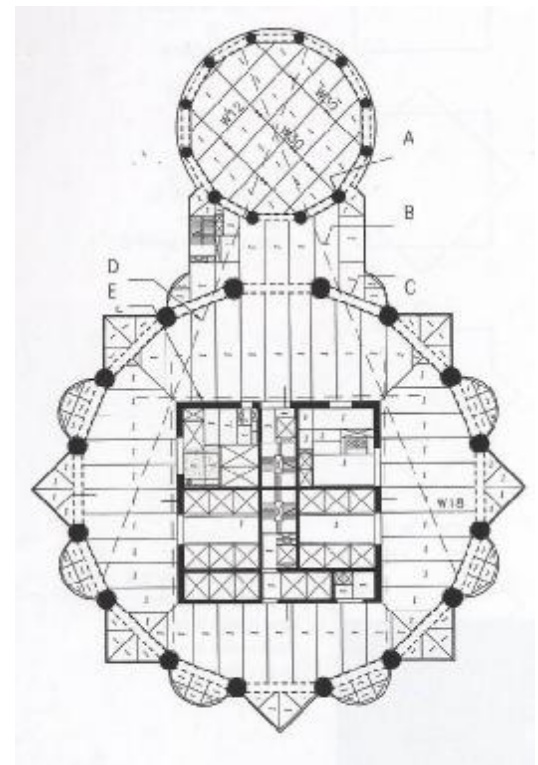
Cross section of one of the Petronas Towers with the concrete elements heavily shaded. Note the relatively light (W18) steel floor framing and efficient use of composite deck. [4]
